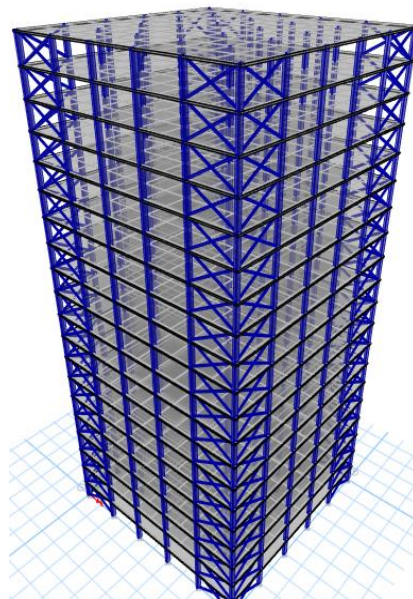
Three-dimension model of a structure with flat slab and bracing at corner
